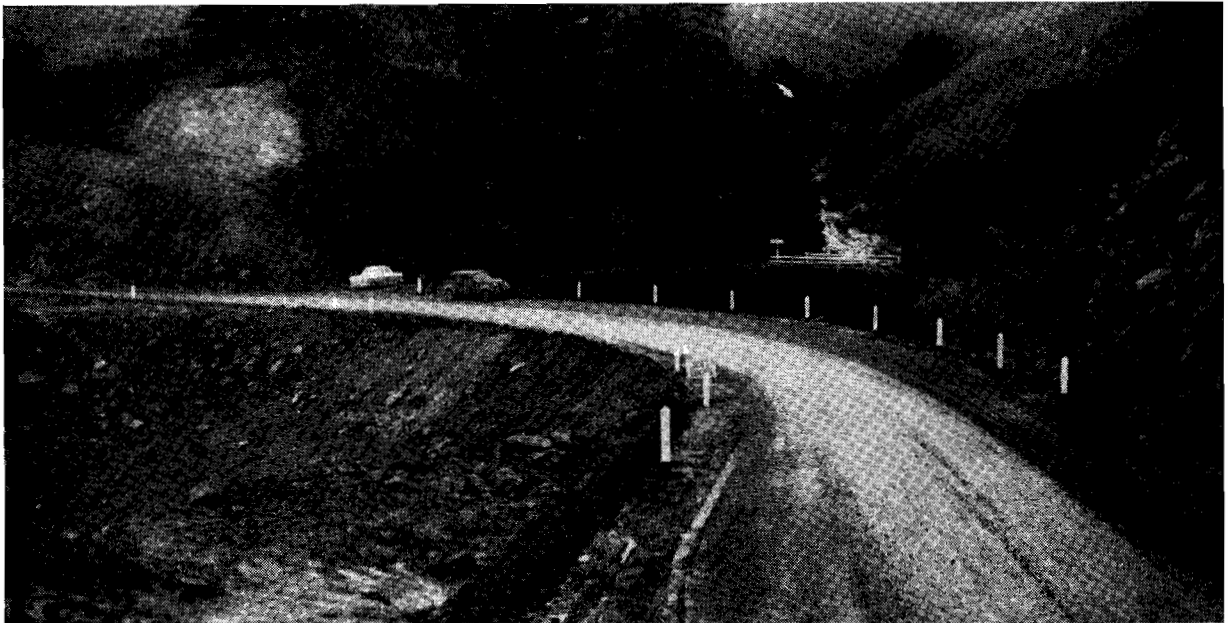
Shire of Otway. Ocean Road. Realignment including new culvert at Flatbottom Creek.
